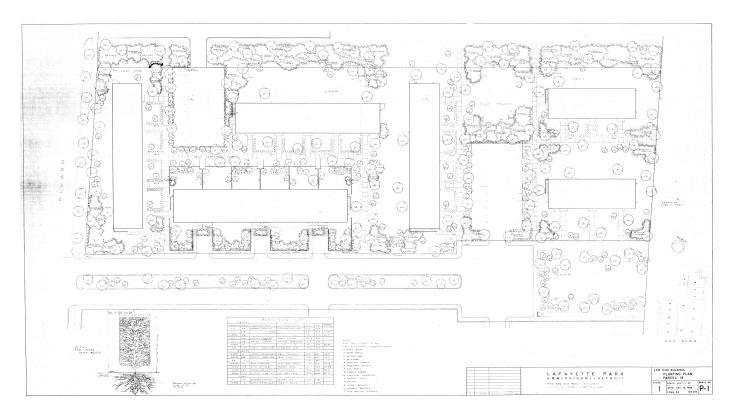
Drawing Sheet P-1, Planting Plan, from the Lafayette Park Construction Documents Set of 1958.
